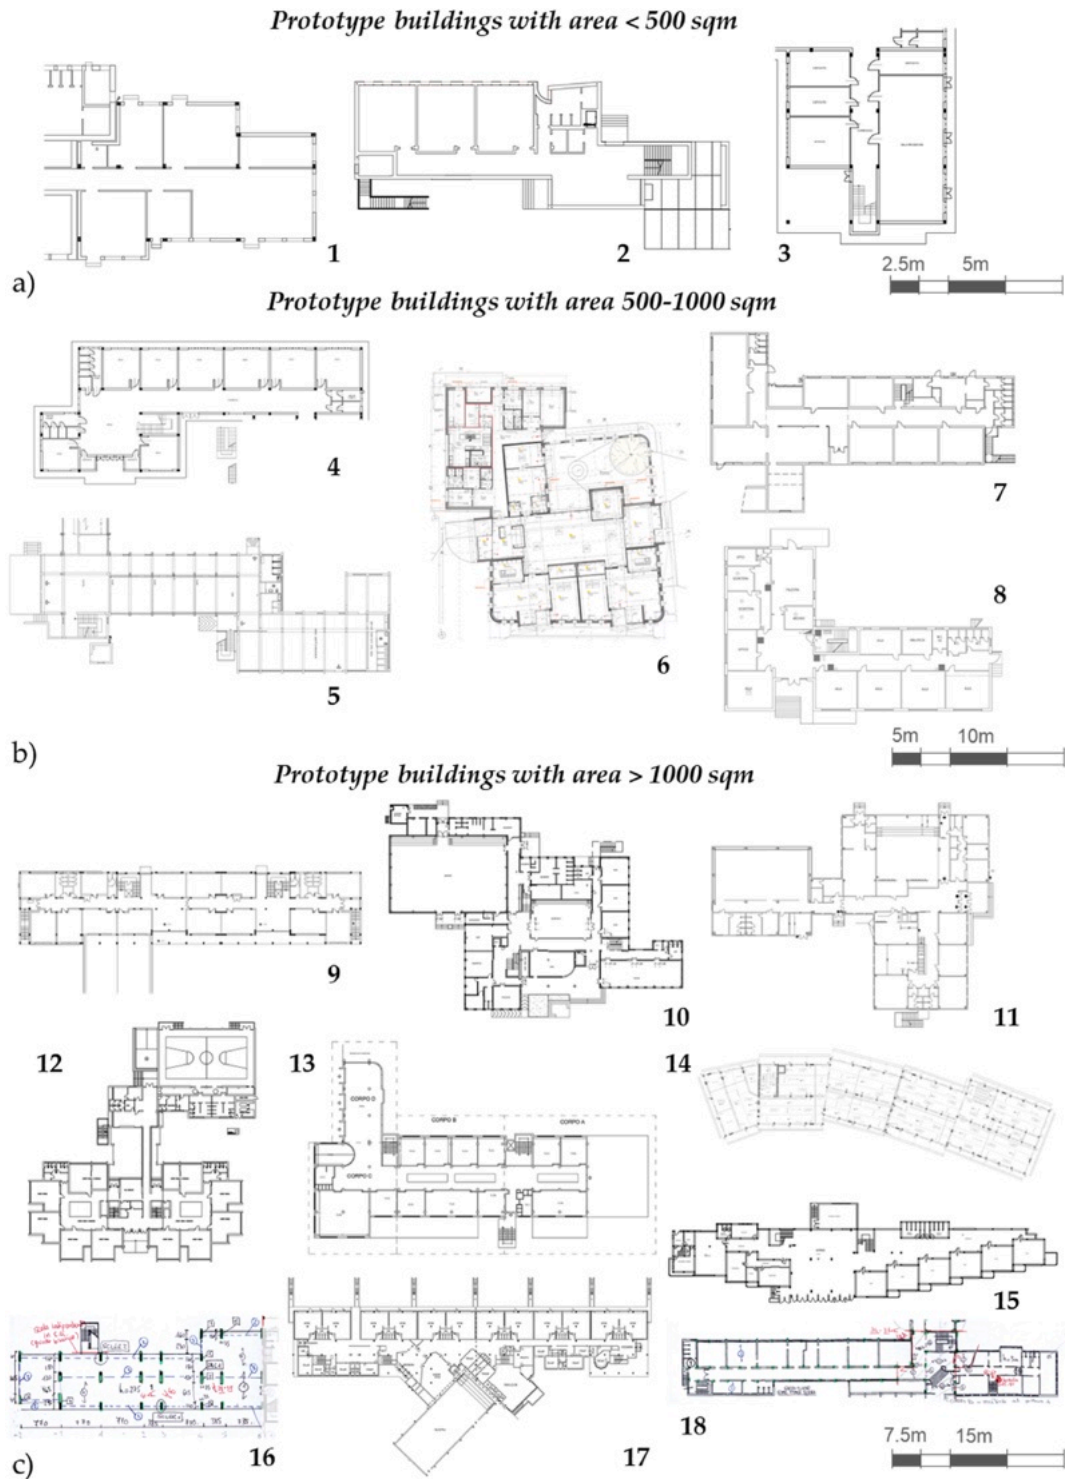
Figure II. Floor plans of RC school building archetypes distinguished by plan area < 500 sqm (a) plan area 500-1,000 sqm (b) and areas > 1,000 sqm (c).
